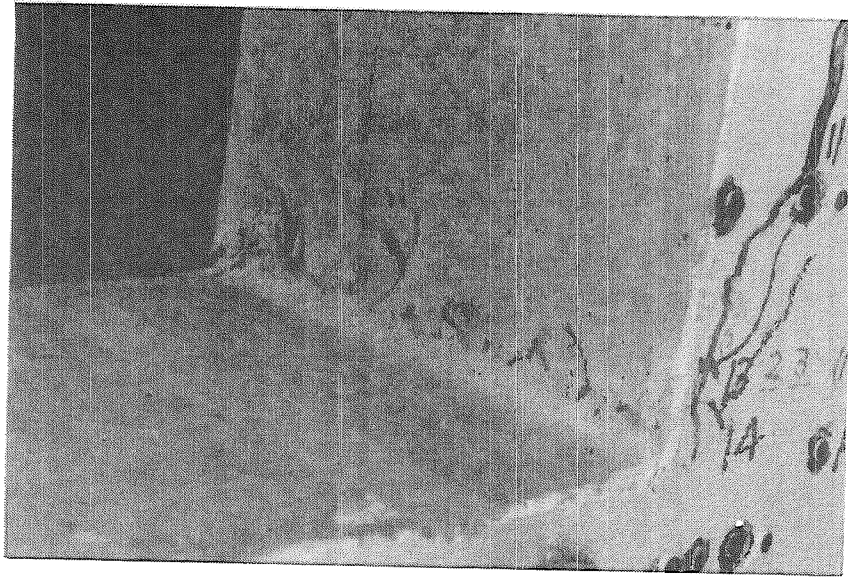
Critical Compression Zone of Beam N1-S62 at Failure
